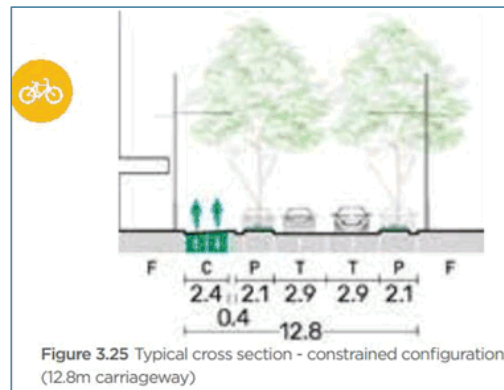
Typical cross section - constrained configuration (12.8m carriageway)
